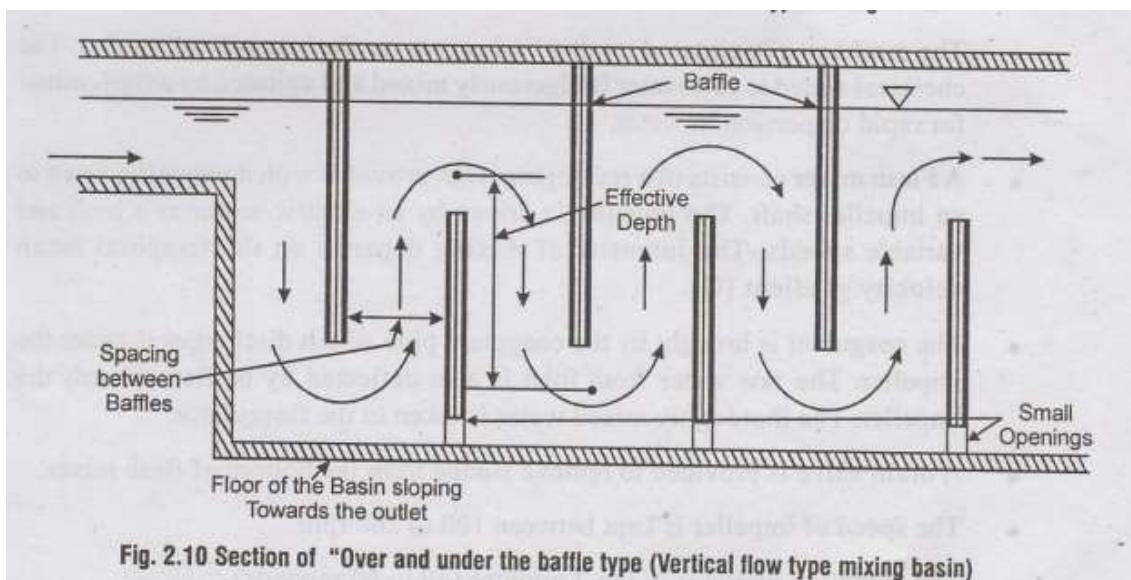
Section of “Over and under the baffle type (Vertical flow type mixing basin)
